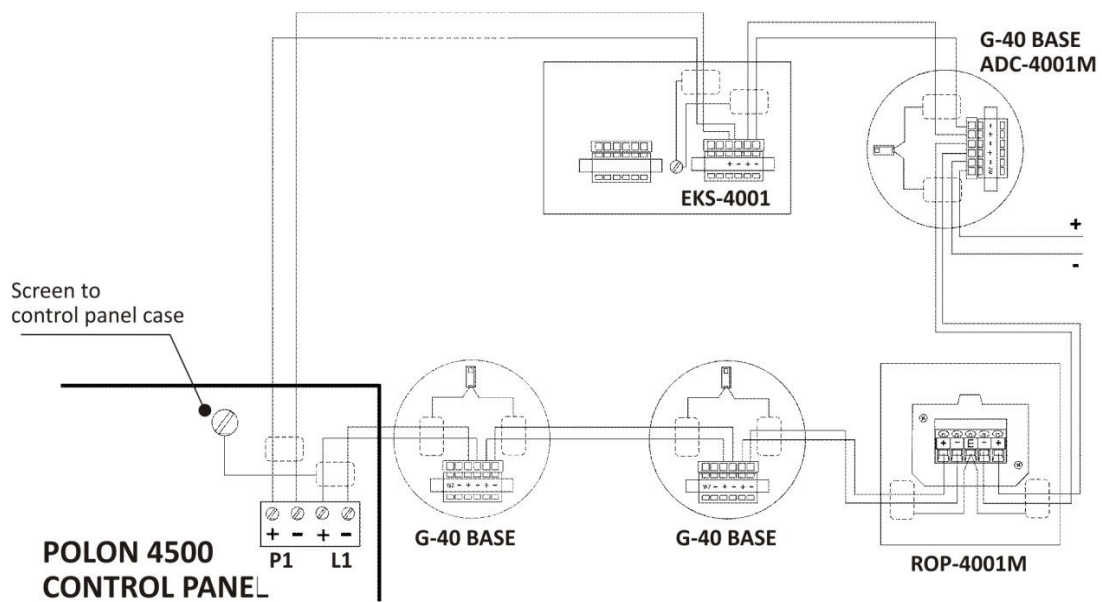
Elements connection way in A type loop-shaped detection line
